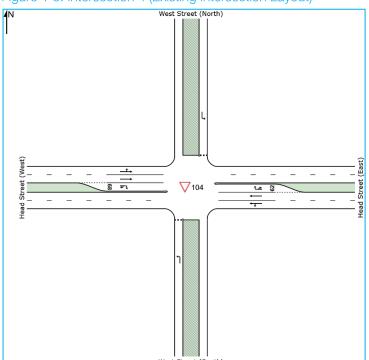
Intersection 4 (Existing Intersection Layout)
